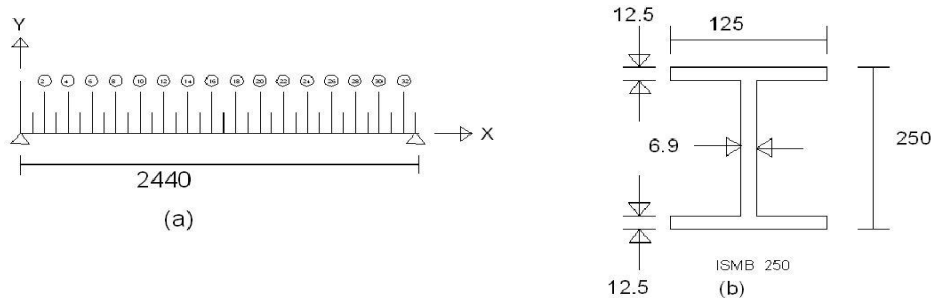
(a) finite element model; (b) cross section of the beam; (all dimensions in mm)
